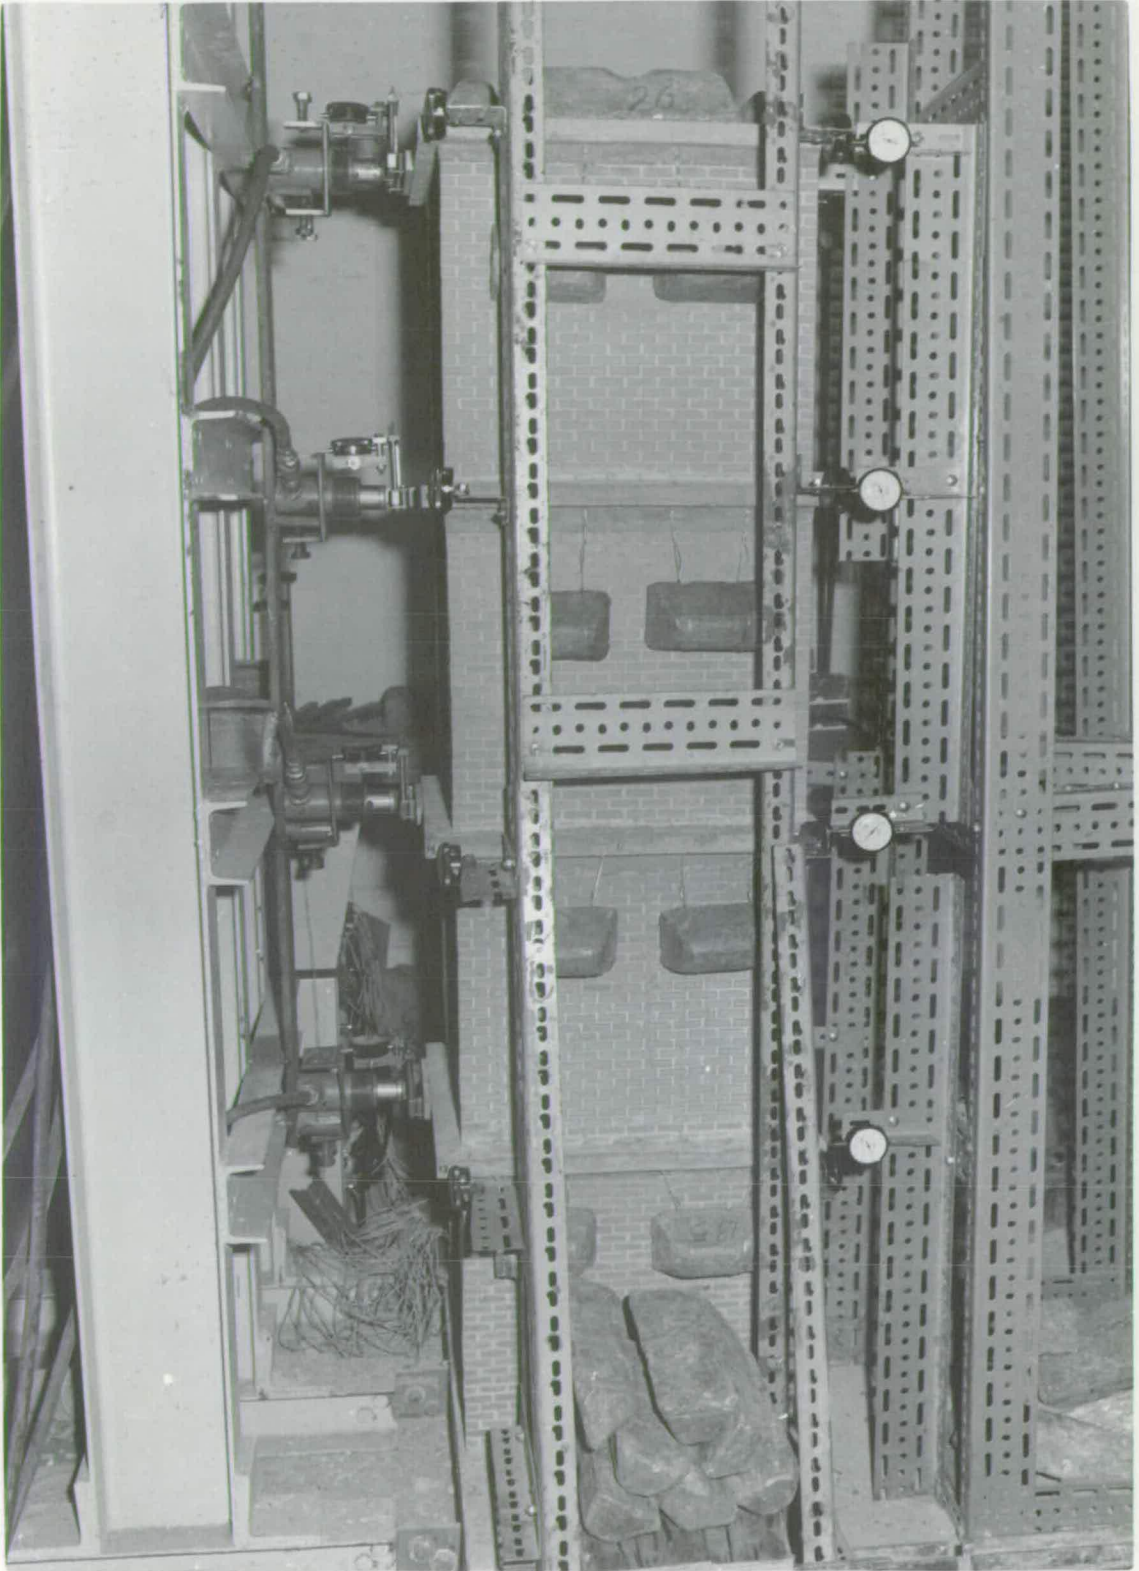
ONE SIXTH SCALE BRICKWORK FOUR STOREY MODEL
